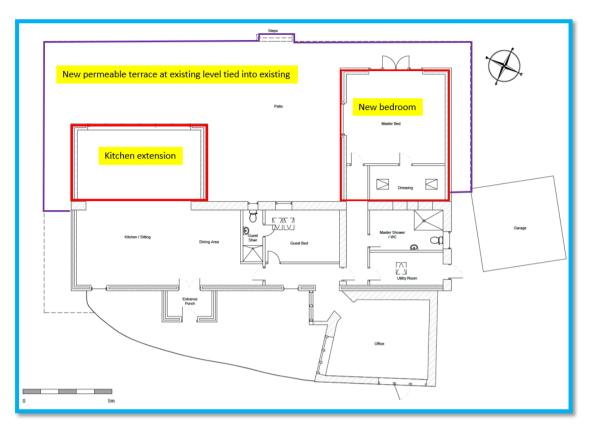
Proposed extensions of building in red, and patio in purple outline.
